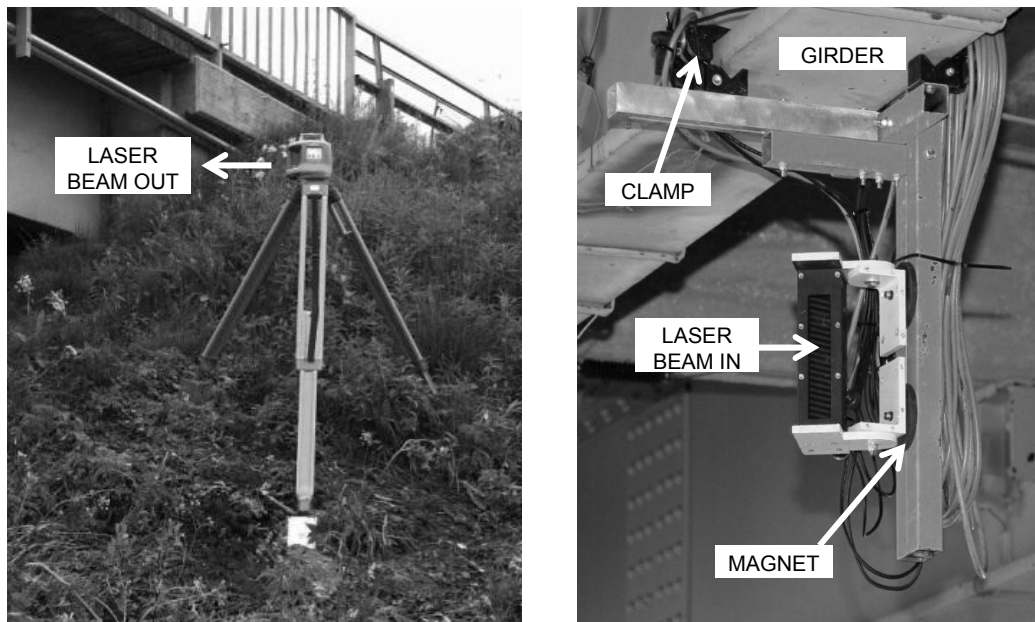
Left, the rotary laser (Sokkia LP410) used for deflection measurement; right, a DMM sensor mounted to the lower flange of a main girder.
